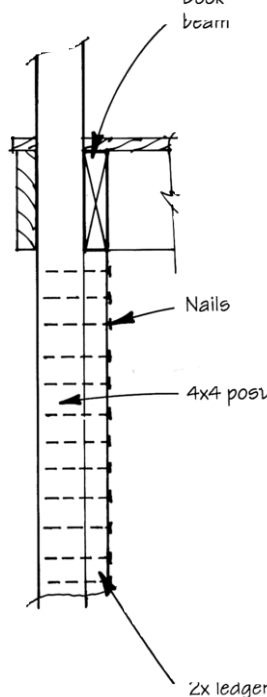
Hanging the deck's main beams from bolts usually doesn't meet code. One approach is to attach a vertical ledger with enough nails or lags to support the rated load — or run the ledger down to the pier foundation.
